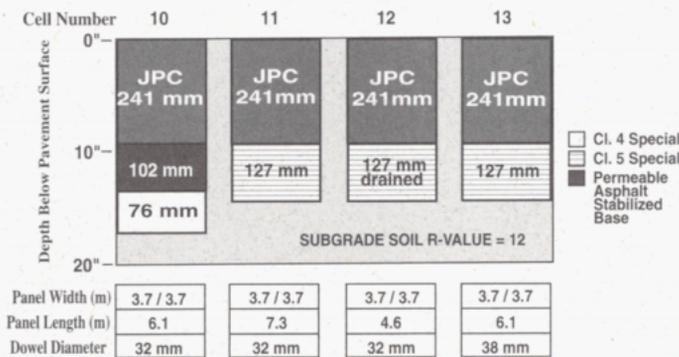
Mn/ROAD 10-Year Mainline Concrete Test Sections
